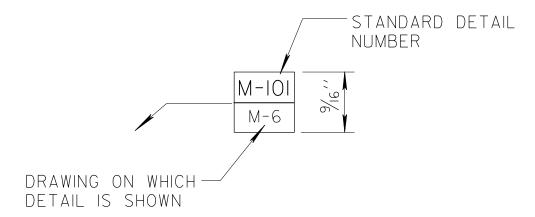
DETAIL IS IDENTIFIED ON DRAWING 8-M-7 AS:
